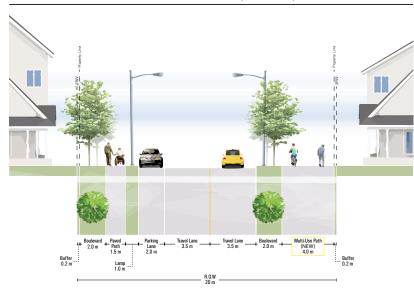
A COLLECTOR WITH 2-WAY CYCLETRACK (68 AVENUE AND 60 AVENUE)
